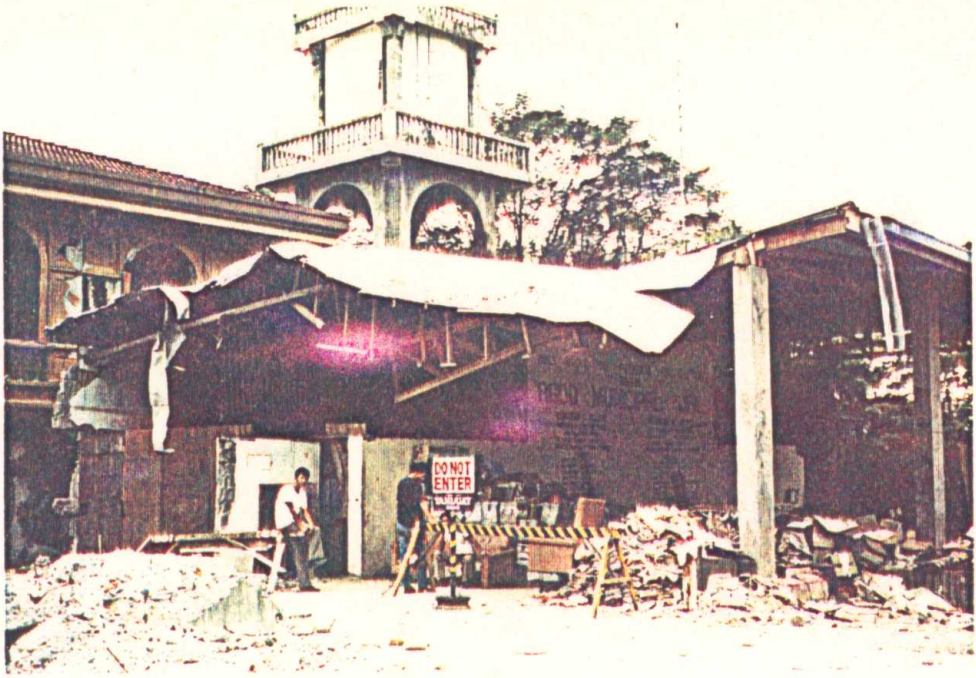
Partial failure of the jail building in Ago. No considerations are made to be earthquake-resistant building.
